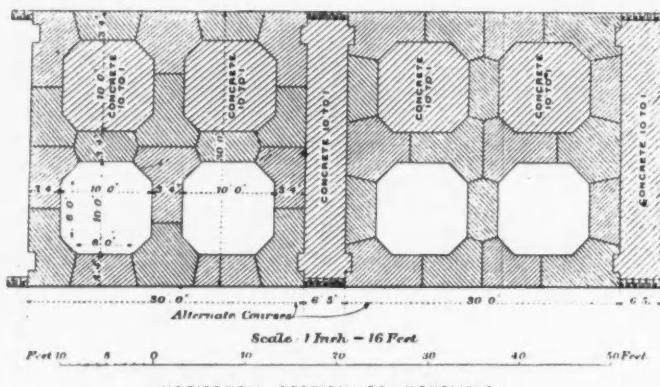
Plan of two adjacent monoliths at Tilbury showing intermediate space filled with concrete.
